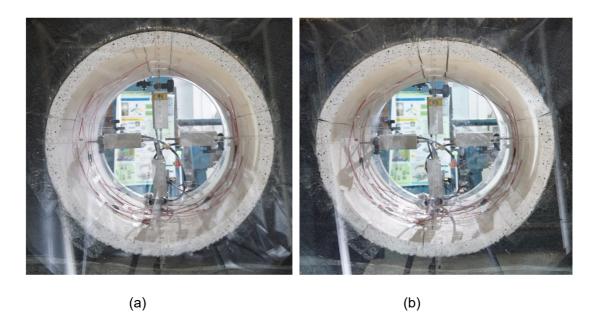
Photographs of the tunnel without strengthening (a) the initial tunnel profile; (b) the damaged tunnel profile
